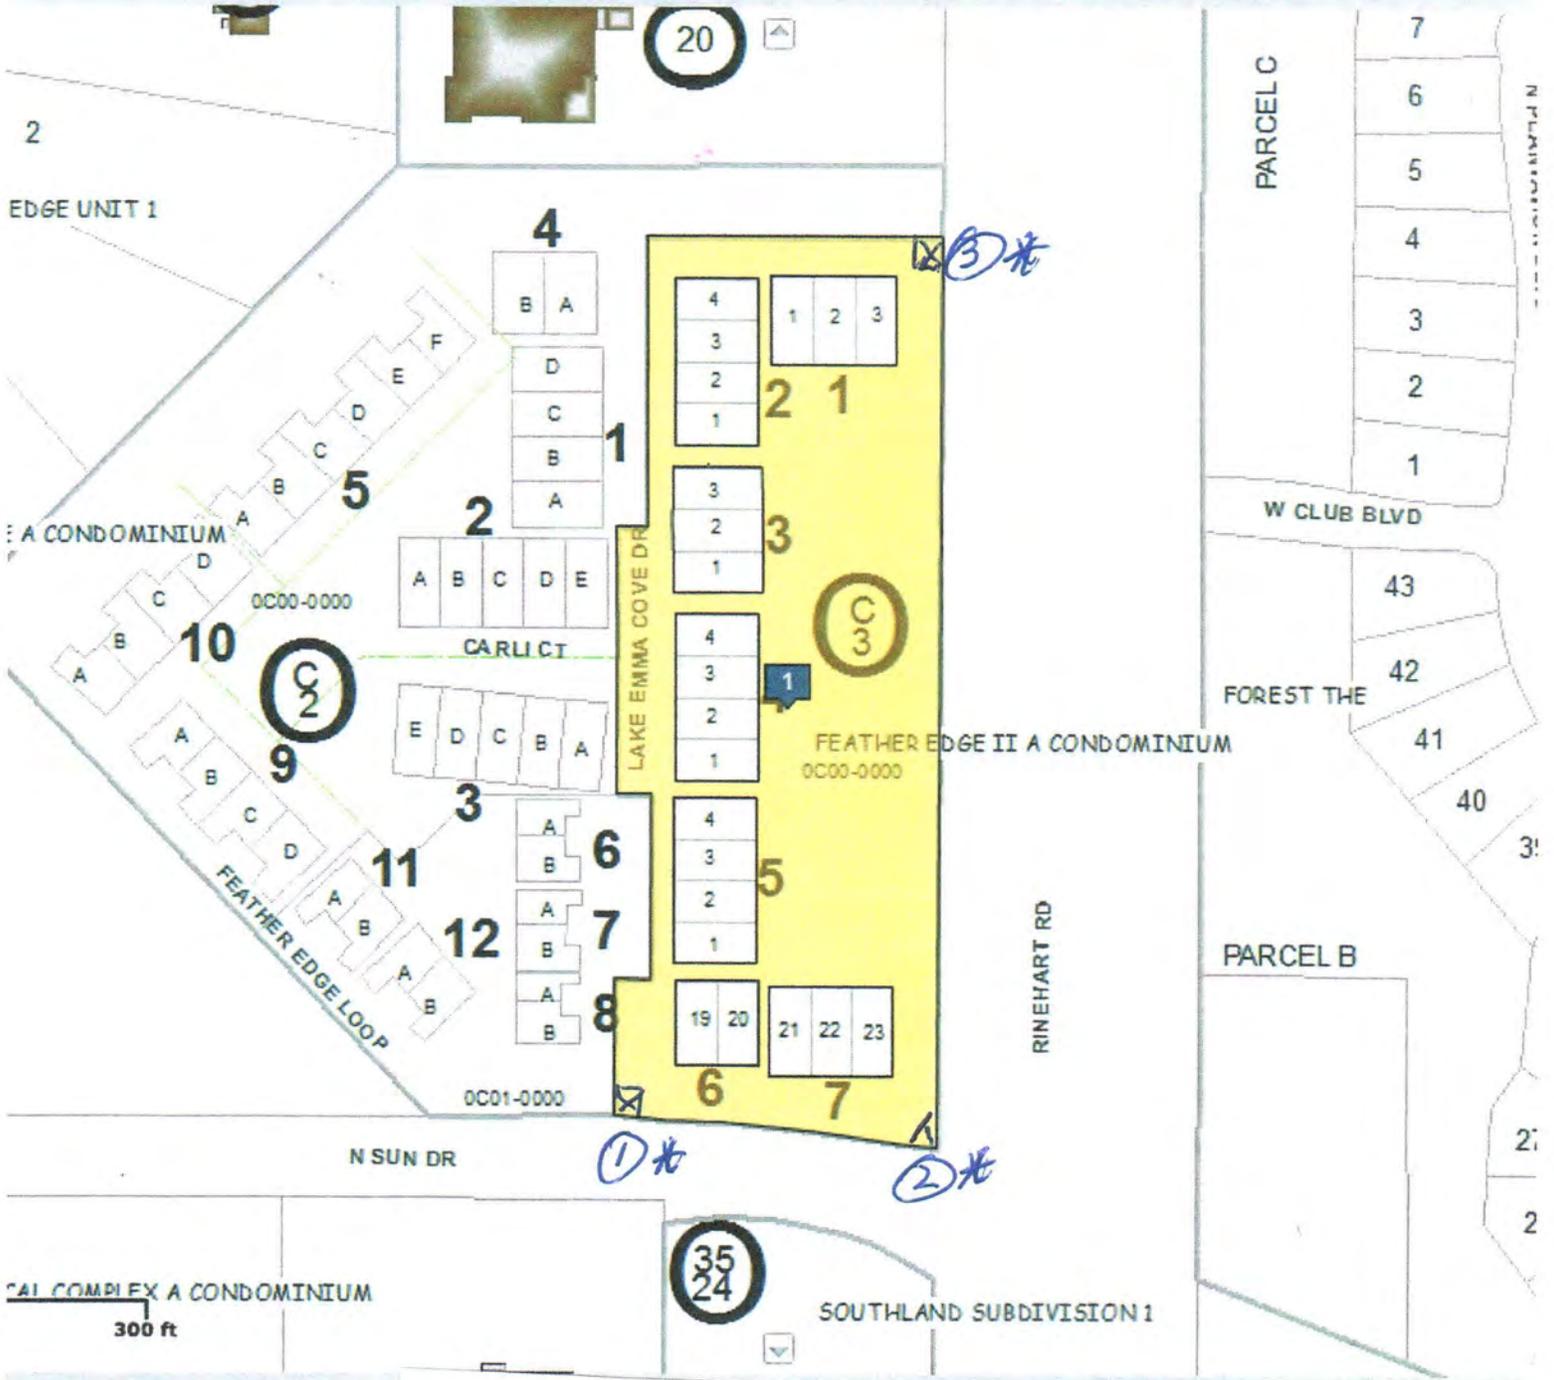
EXHIBIT "D" – SITE PLAN INDICATING 3 AREAS OF IMPROVEMENT
